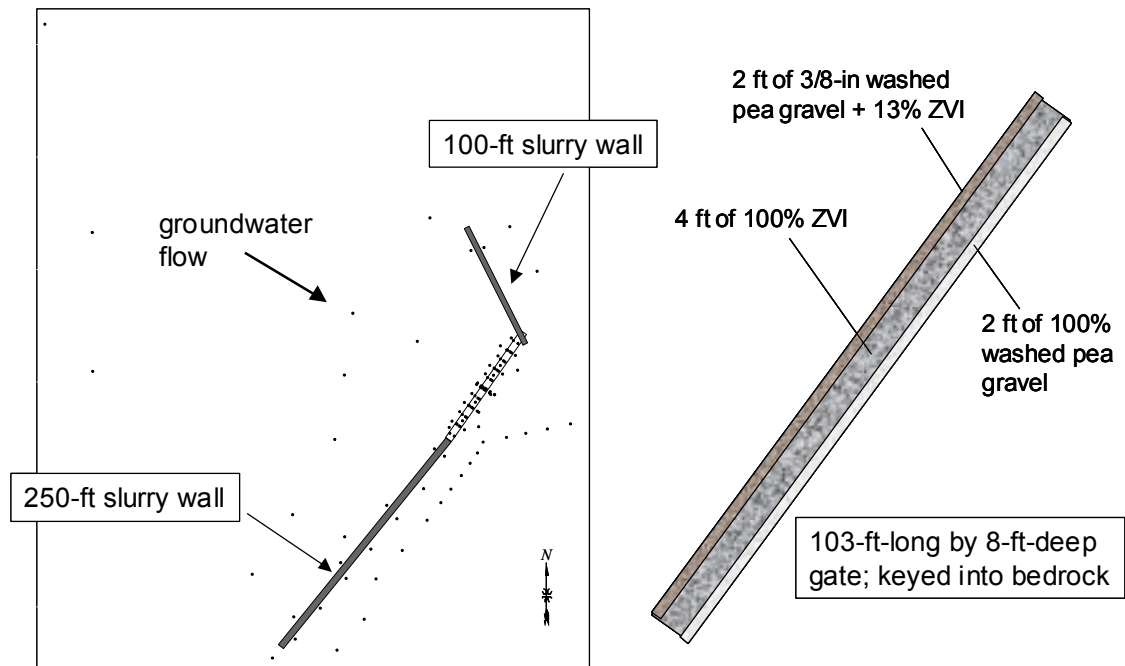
Plan View of Monticello PRB and Detailed Schematic of Permeable Section
